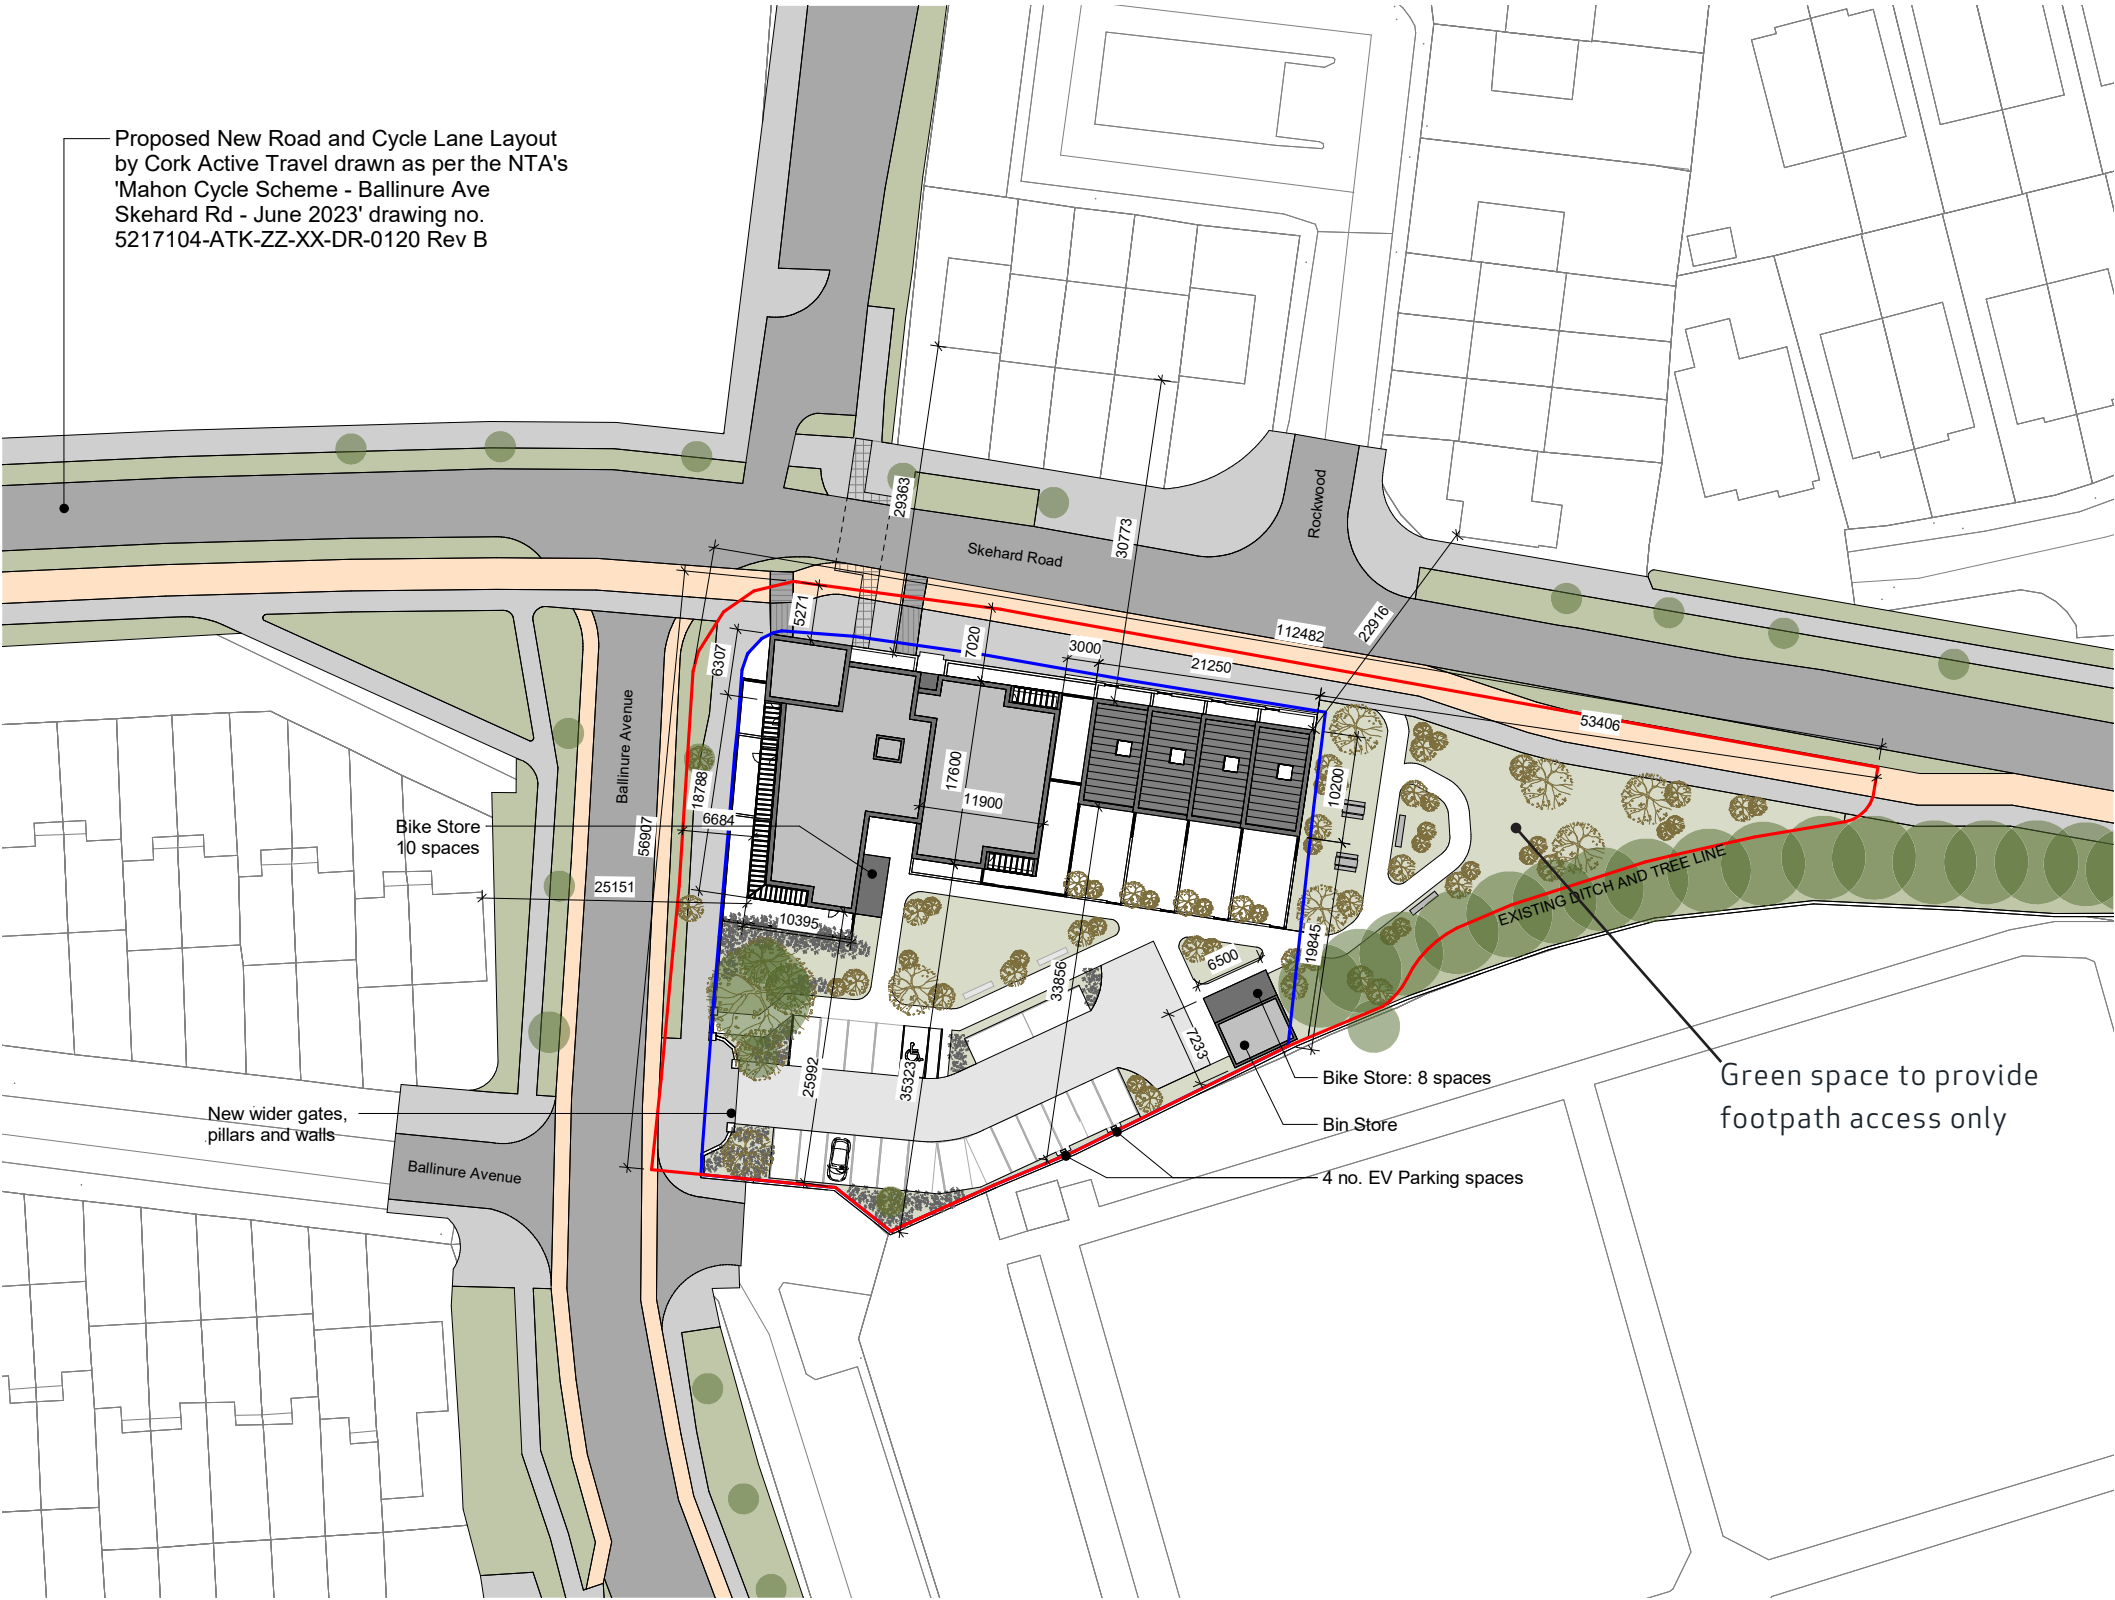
Proposed Site Layout Plan showing future condition, scale 1:500 @ A3
